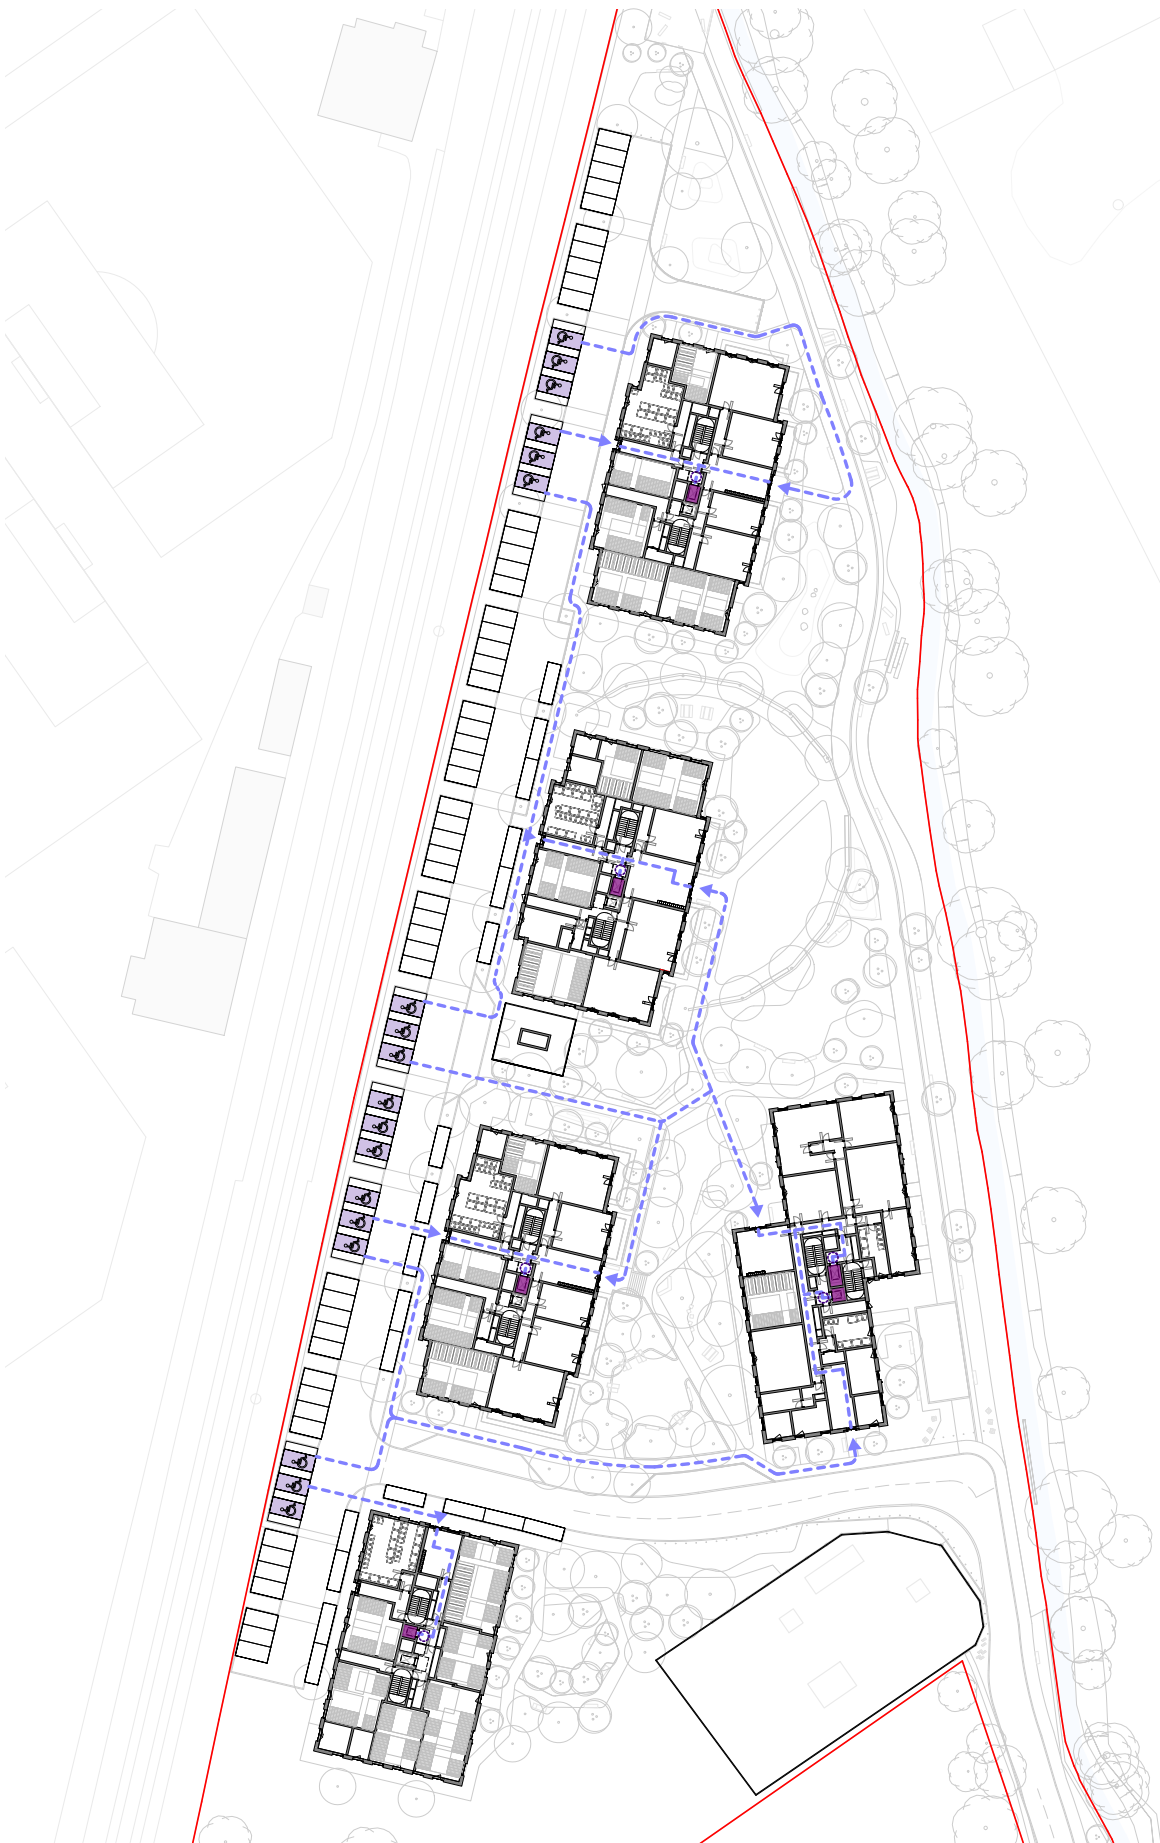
Site layout showing ground floor – Inclusive access provisions
